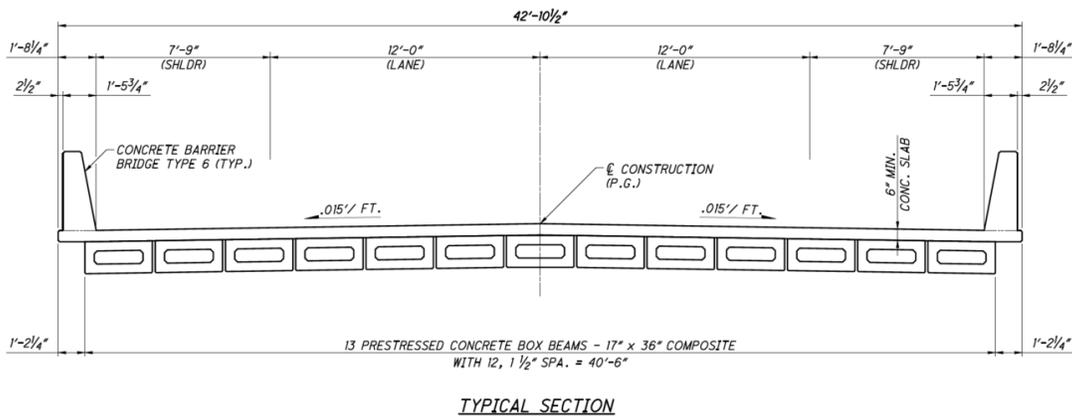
Schematic bridge section for M-22 Elberta/Frankfort
